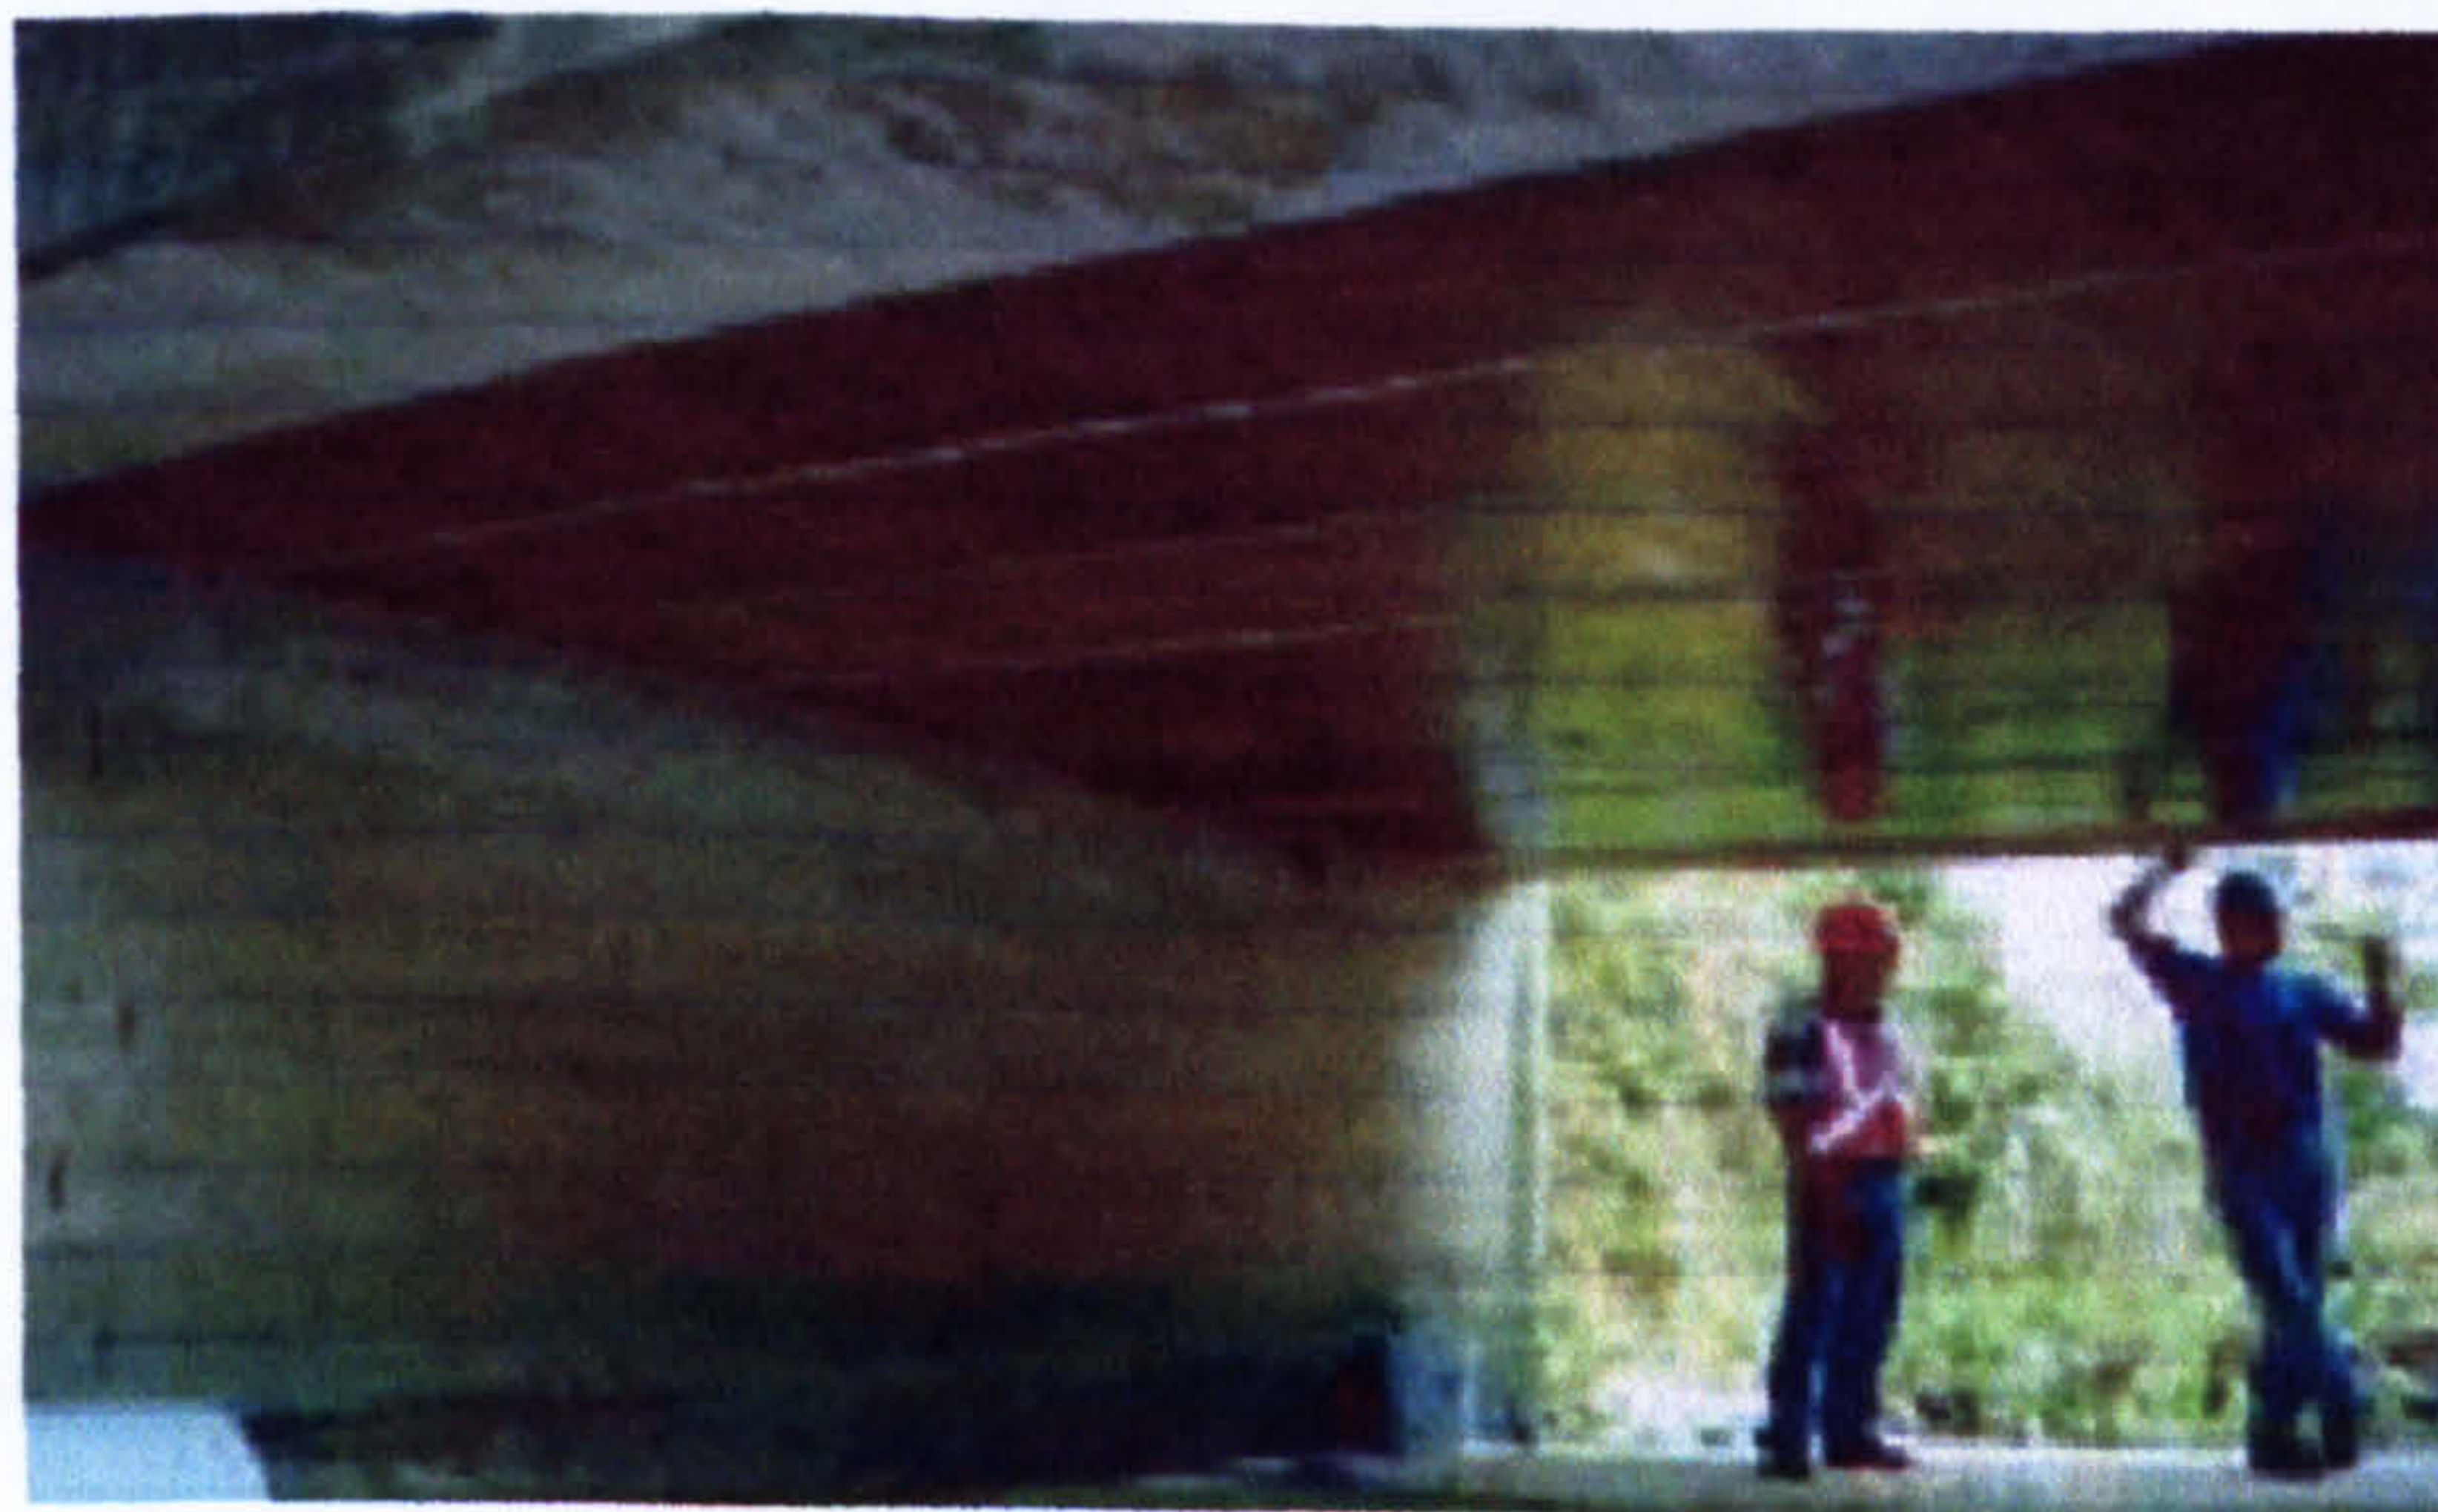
FRP laminates installed to improve the bridge's flexural strength, after corrosion of steel and deterioration of concrete, Missouri, USA (After Nanni, 2001)
